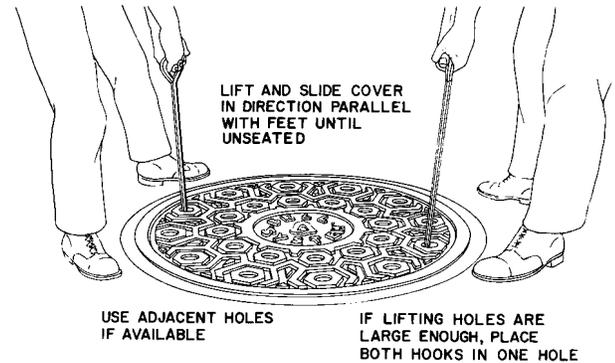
Unseating Cover With Lifting Holes in Cover Surface
